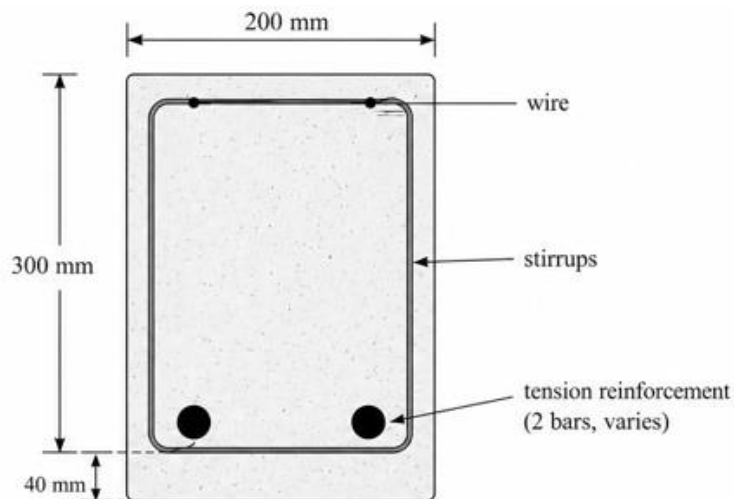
Cross-sectional view and reinforcement details of the test beams
